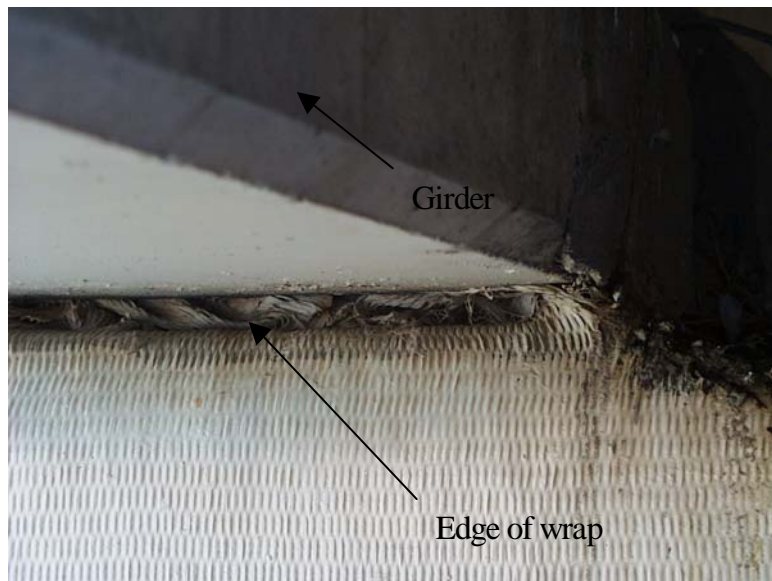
Finish of FRP wrap around girders of Structure #7.
